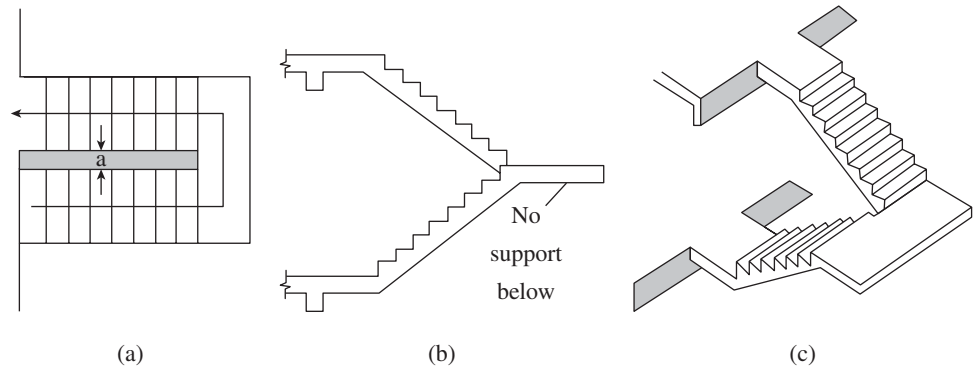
Typical free-standing stair (a) Plan (b) Section (c) Isometric view
